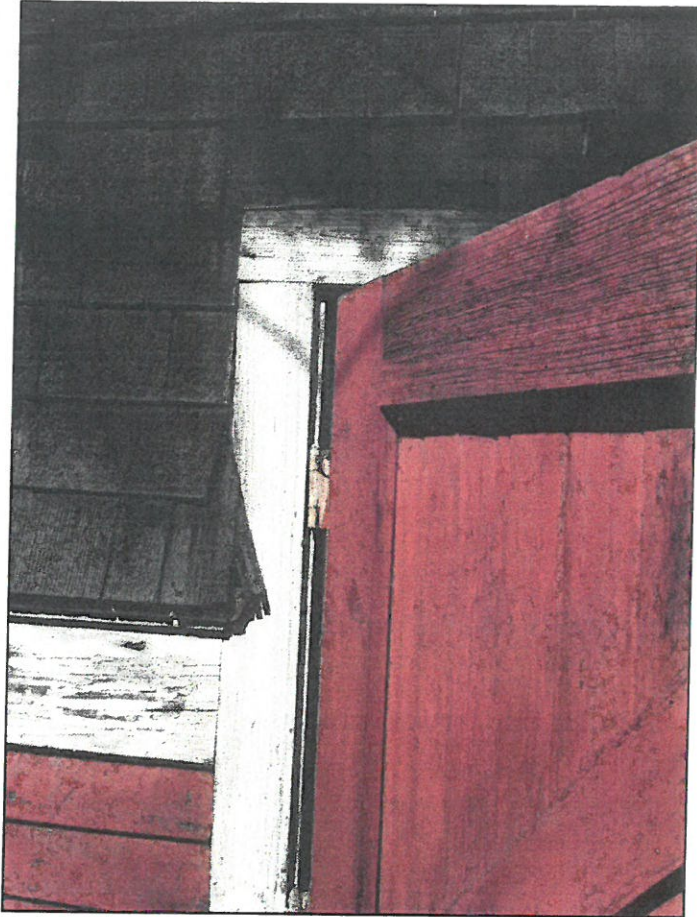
A close-up photo of the west walk in door on the south side. This photo illustrates the elaborate shingle detail at the junction of the lower siding, the upper shingles and doors and windows.
